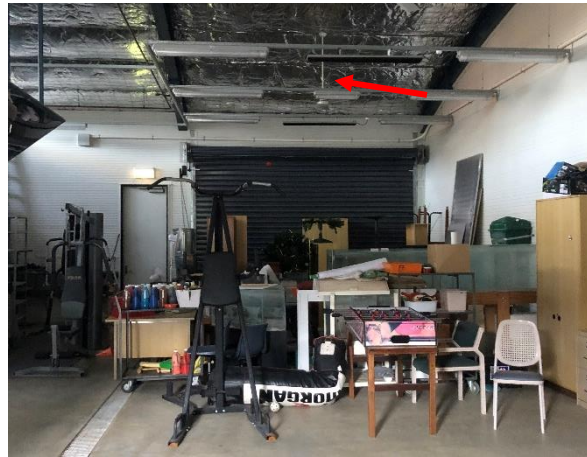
Building F – Suspected SMF insulation to aluminium sarking over ceiling lining
